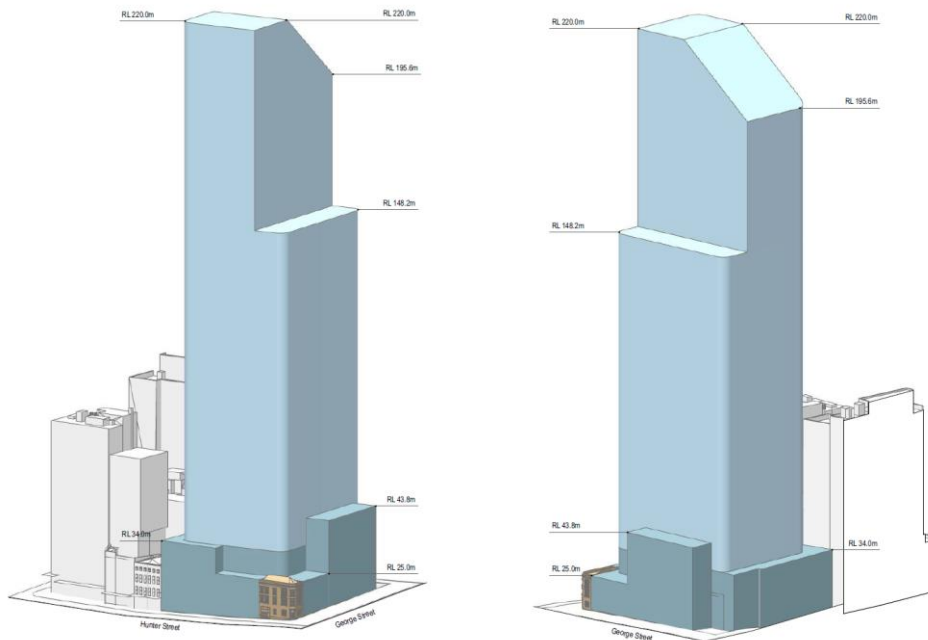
Western site – envelope massing (left – view from north west, right – view from south west)
